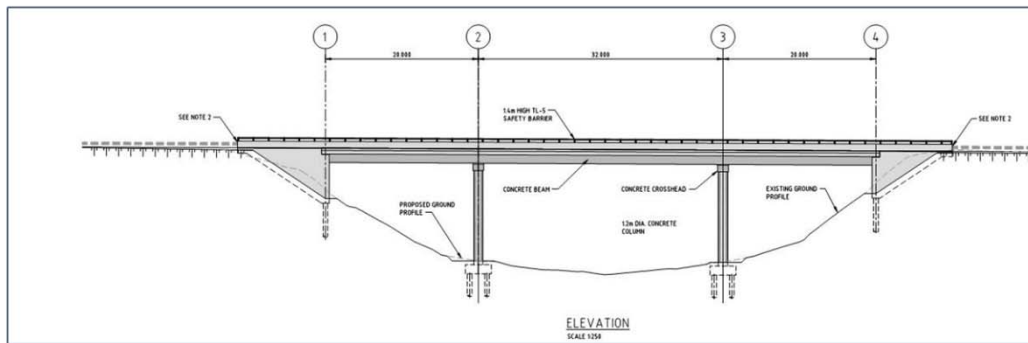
Conceptual elevation- East-West Gully crossing (Hollow core deck shown – final form subject to detailed design)
